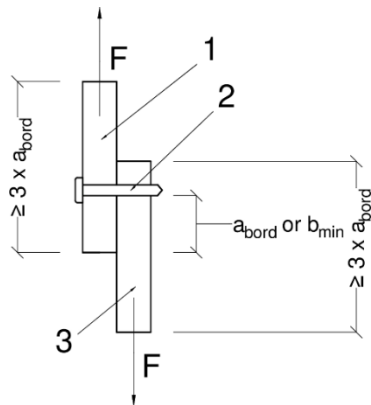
Example of shear load exerted on the test specimen for kits family A, D & E (border or corner position).
